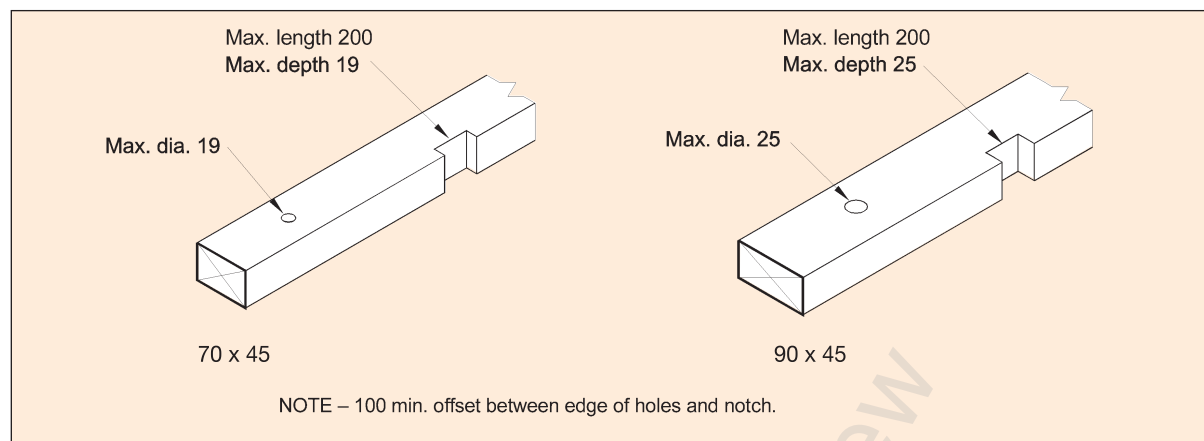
Checking and boring top plates (see 8.7.5.1)
